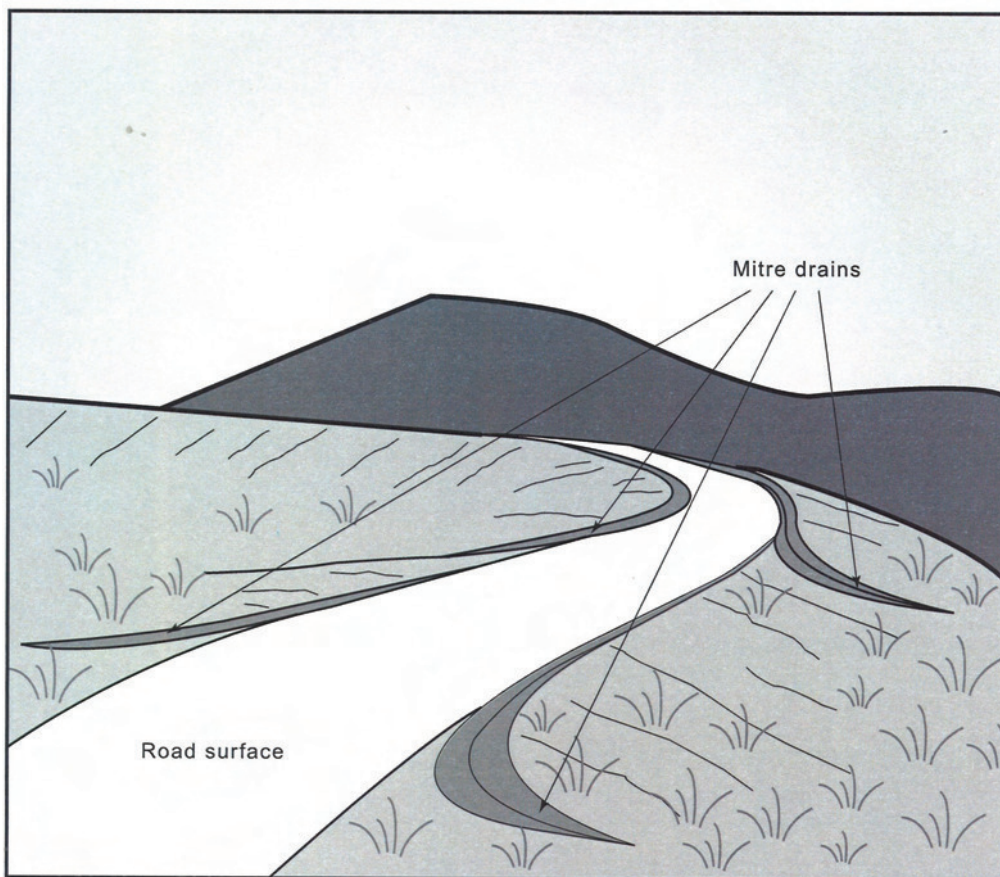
Typical layout of mitre drains on ridge top tracks (Source: Managing Urban Stormwater; Soils and Construction – Volume 2C Unsealed Roads).
